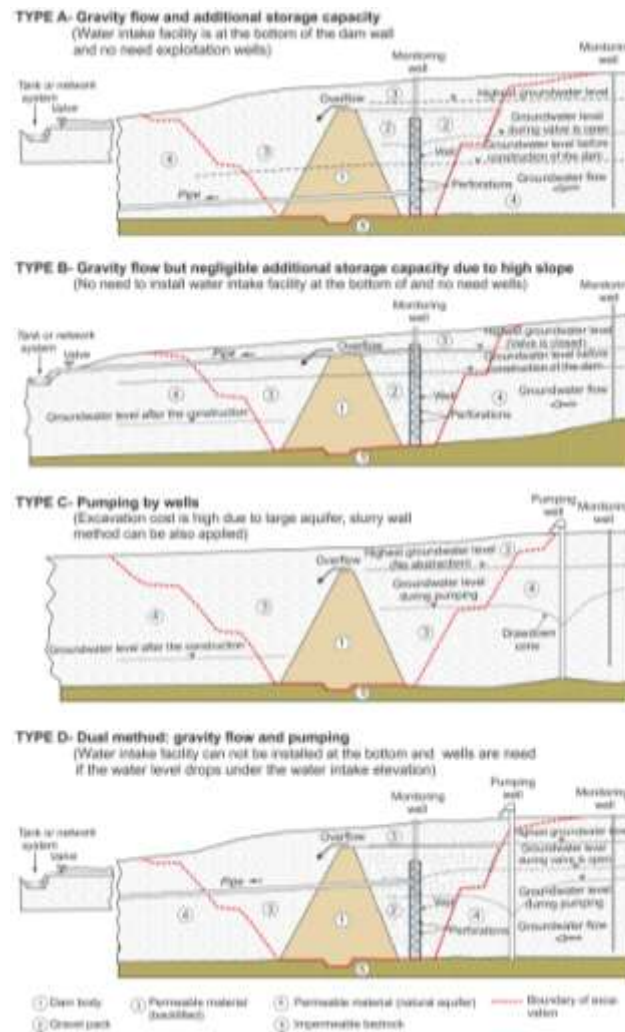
Suggested project types of groundwater dam for alluvial sand-gravel aquifers (dam type was considered as earth in the figure, however it may be constructed by concrete, slurry wall, etc.)
